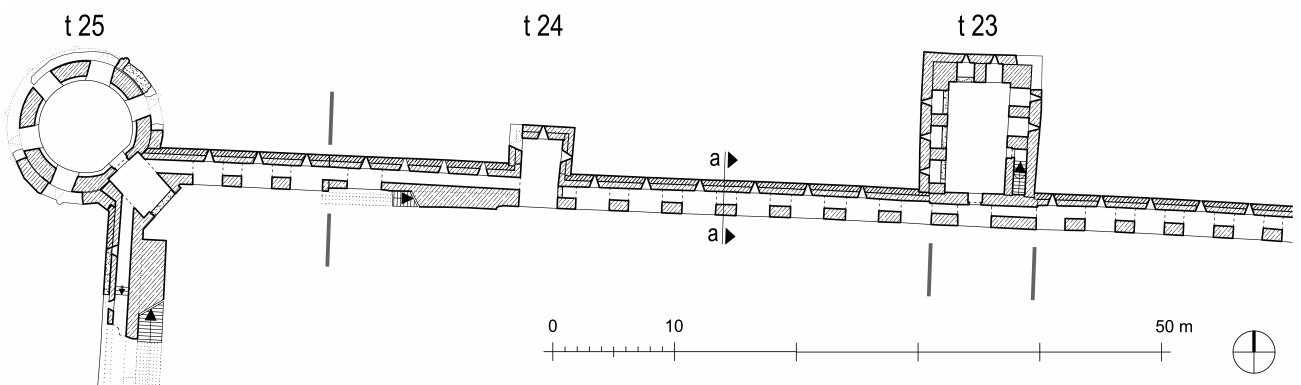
Resafa city wall, north wall between towers 23 and 25; partial plan from geodetic survey 2006–2008
